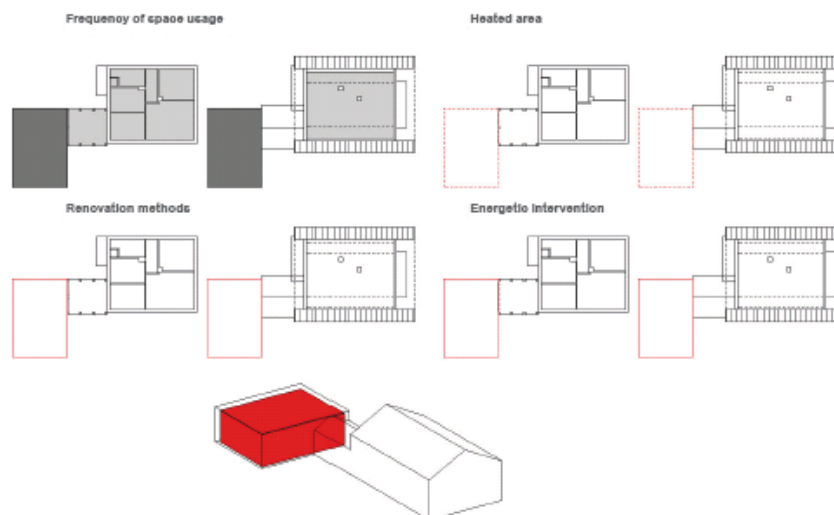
Alternative concepts for AlpHouse pilot-building S. in Schleching-Ettenhausen, by TUM Landraum
